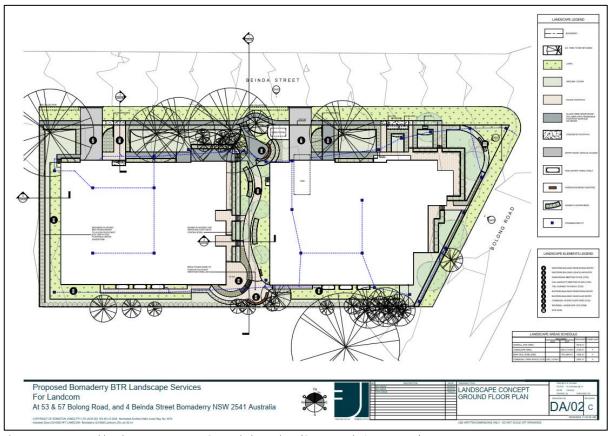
Proposed landscape concept – Ground Floor Plan. (Source: Edmiston Jones)
